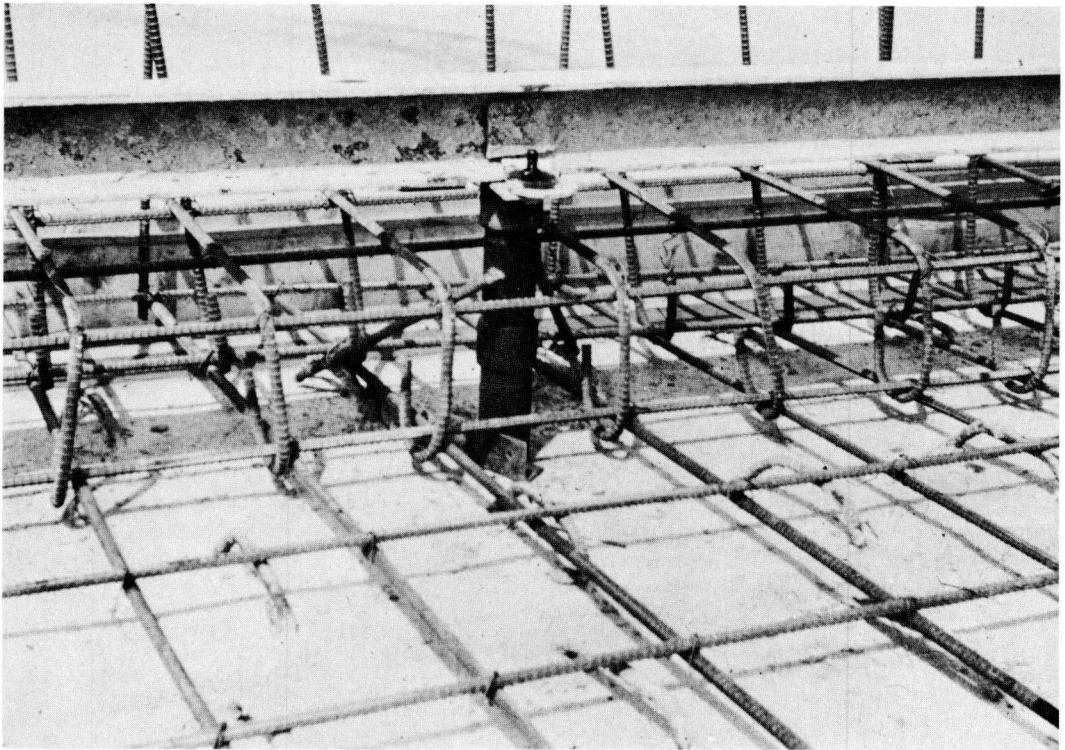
Finishing machine rails should be above the pavement surface. Vertical supports should be fixed on structural members and adjustable to a true elevation.
